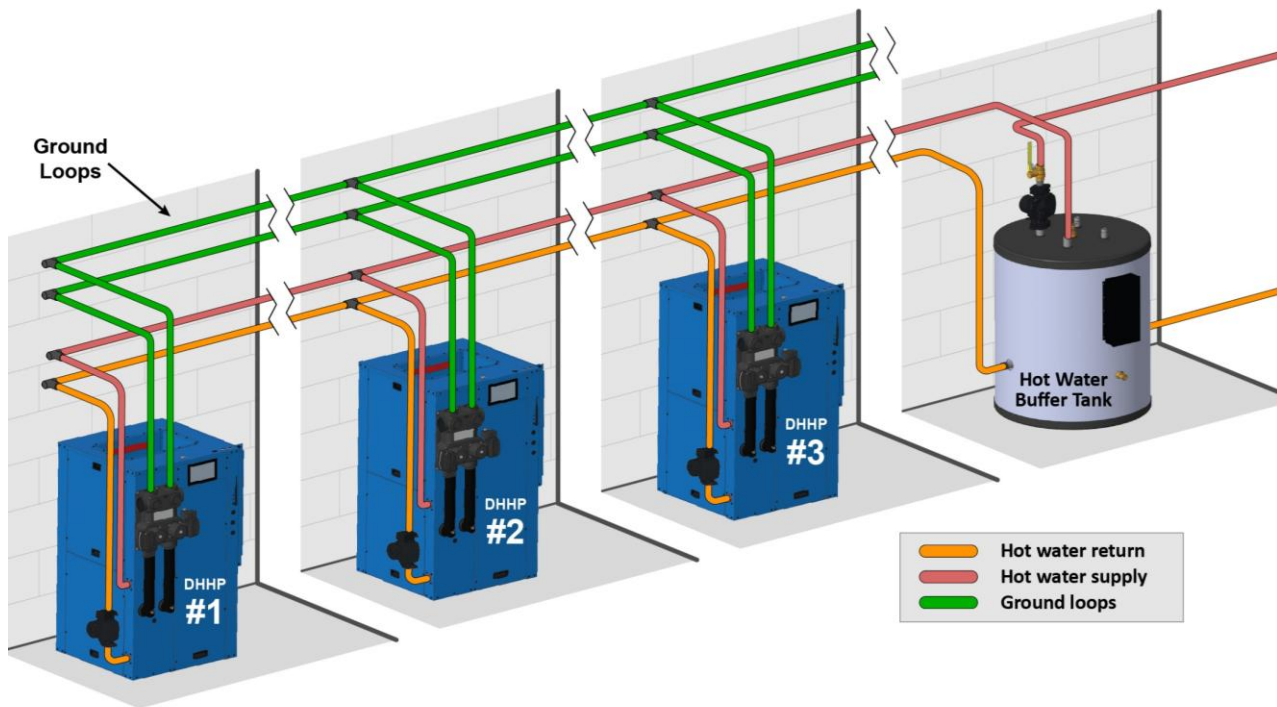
Layout for piping multiple Heat Pump units to a Buffer Tank
